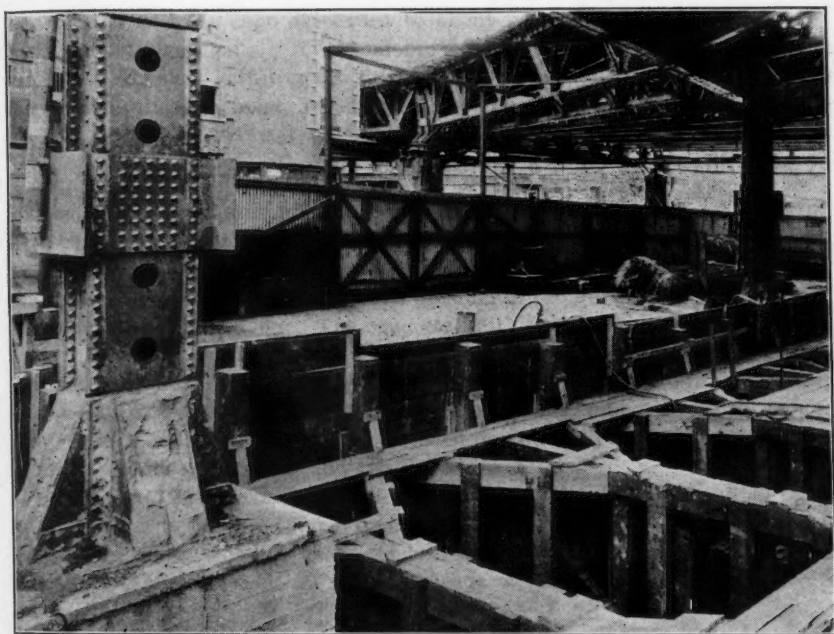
EXCAVATION FOR ESCALATOR PITS, HIGH STREET STATION, BROOKLYN.
